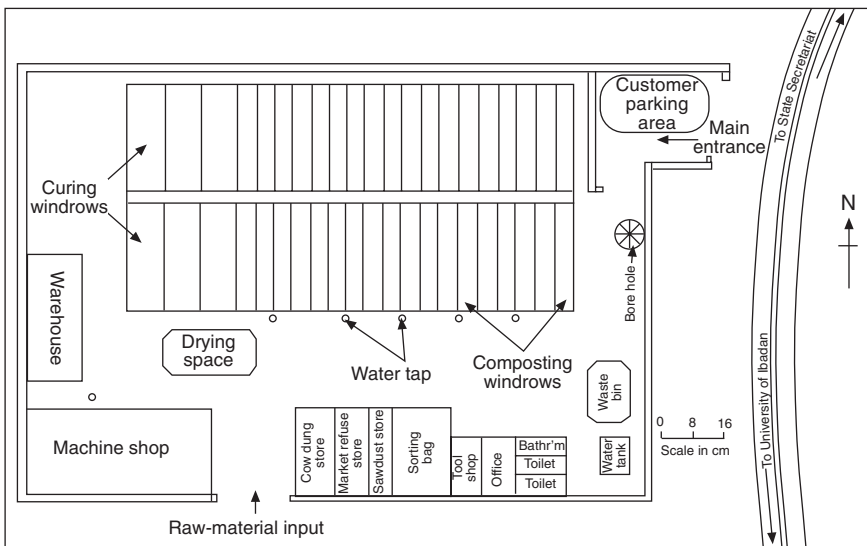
Plant layout of the Pace-setter Fertilizer Plant.
